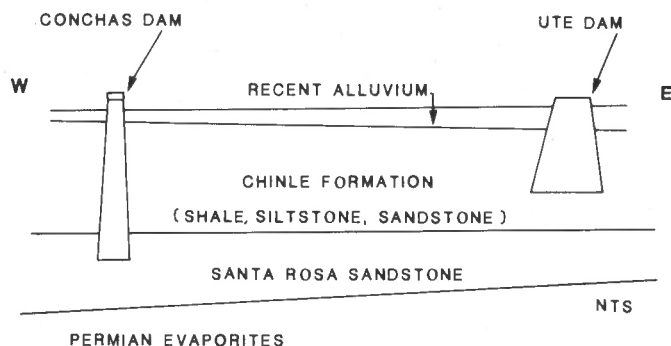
Generalized geologic cross section of the inner canyon of the Canadian River between Conchas and Ute Dams showing units excavated for dam construction.
